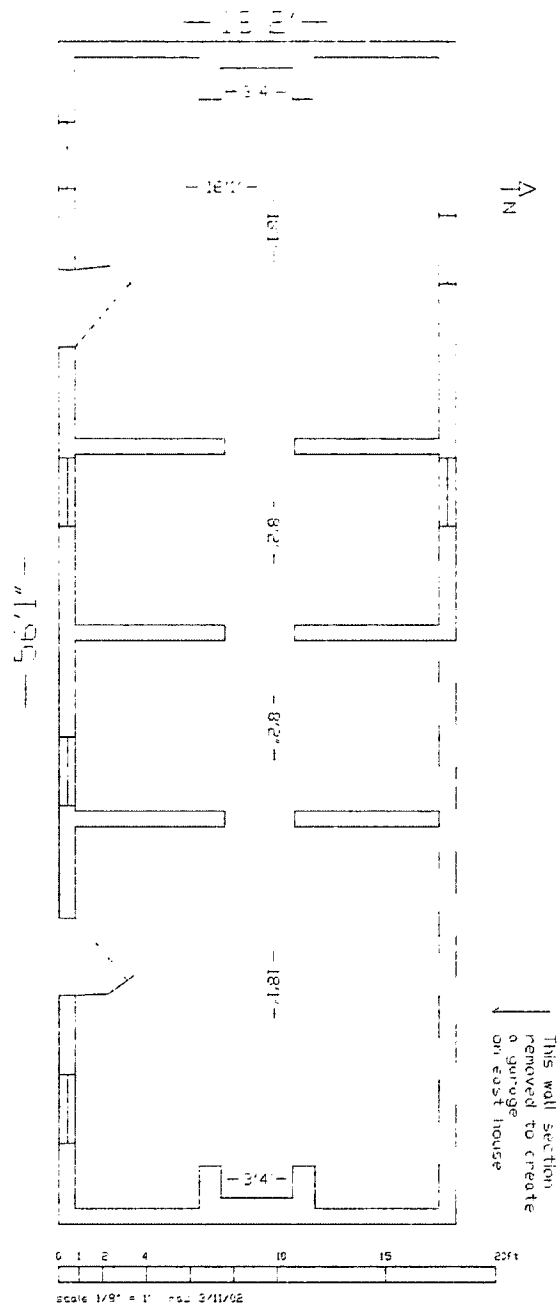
Planview of the east slave house at the Albert Lenoir plantation, Loudon vicinity, Loudon County.
